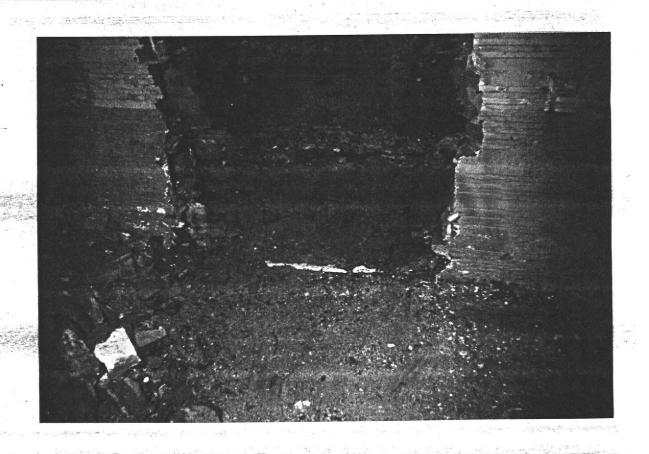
Close-Up View of Base of Removed Section of South Wall 4525 Horton Street, Emeryville, California 14 October 1996
